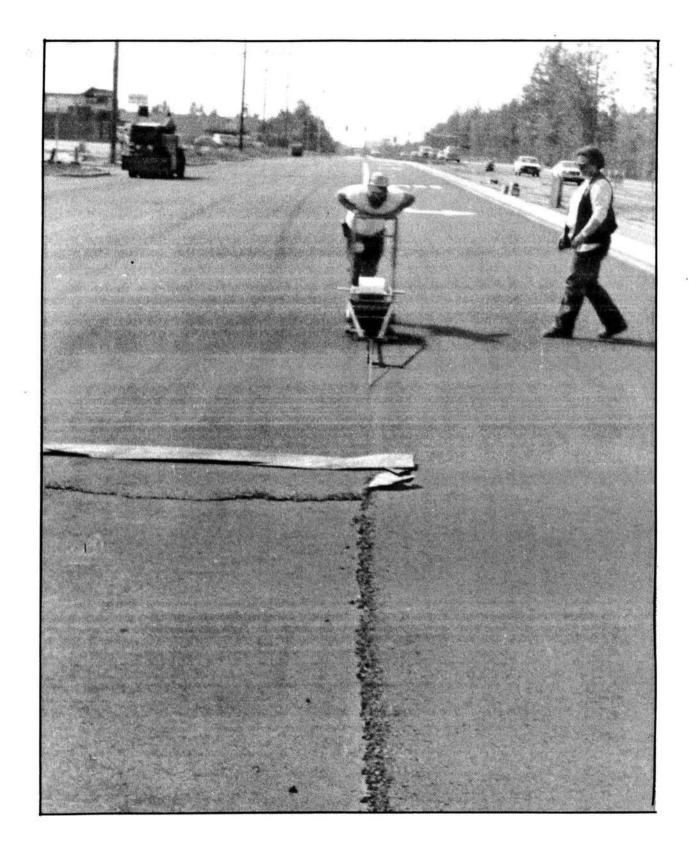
Marking pavement with use of string-line prior to installation of skip striping (Northern Lights Boulevard).
